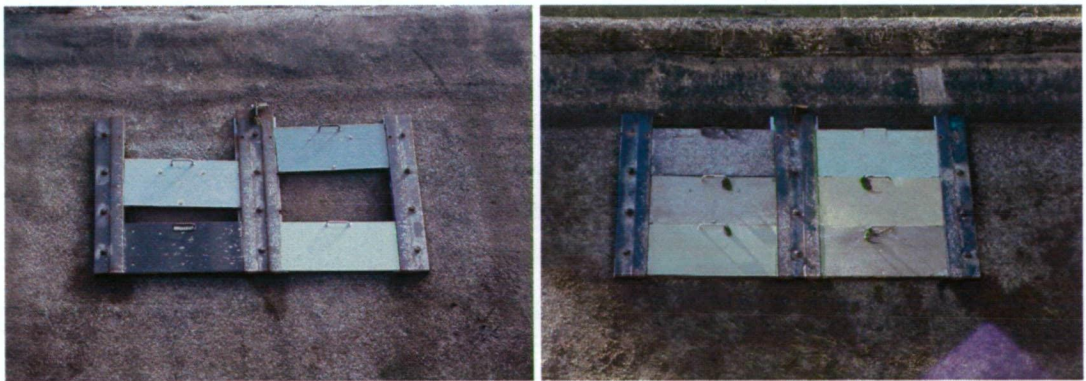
Typical test plate arrangement installed in Tarraleah canal system.
